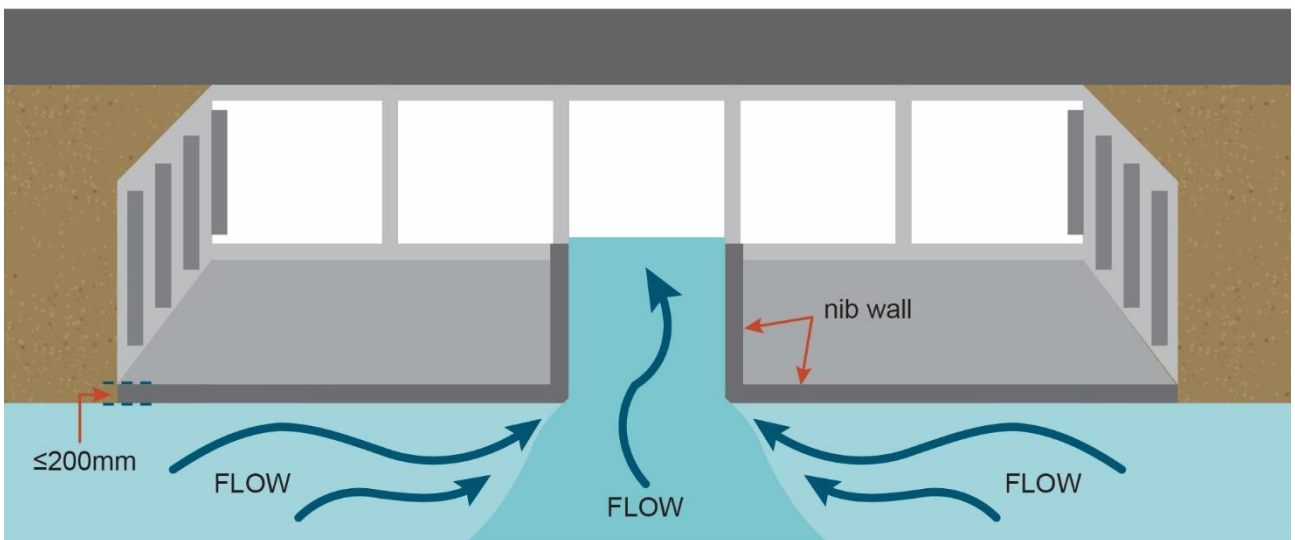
Interim nib walls on existing culvert crossing (cross-section of waterway) – tidal (grey), purple, red, amber and green waterways
